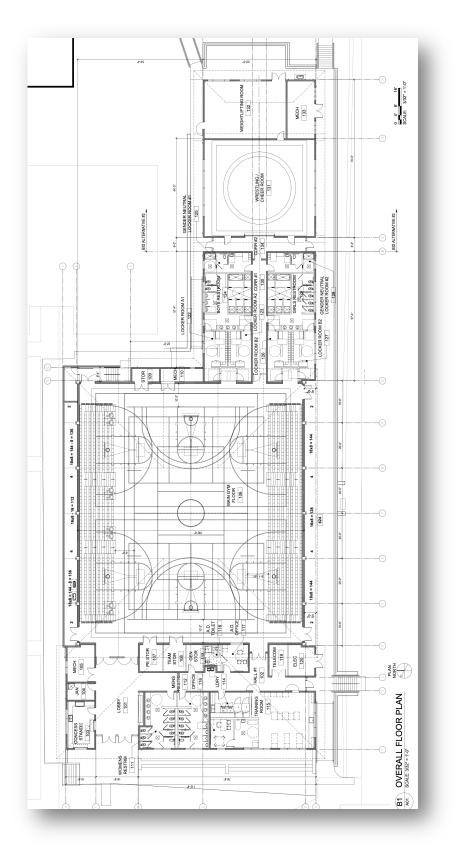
Gymnasium Floor Plan Source: Design Partners Incorporated
